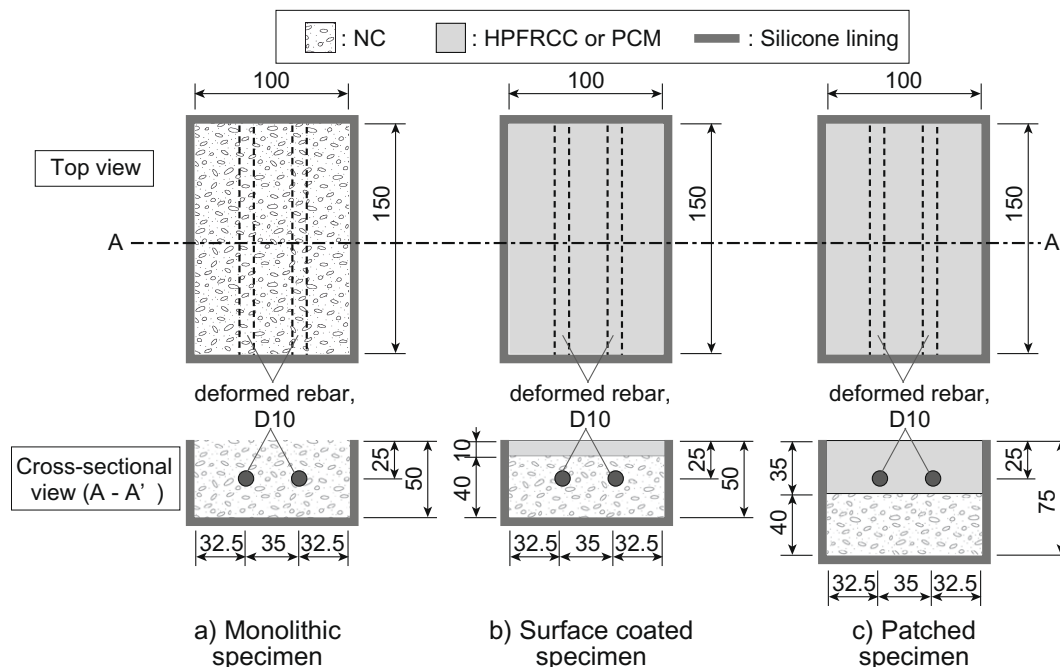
Corrosion test specimens taken out from RC beams (unit: mm).
